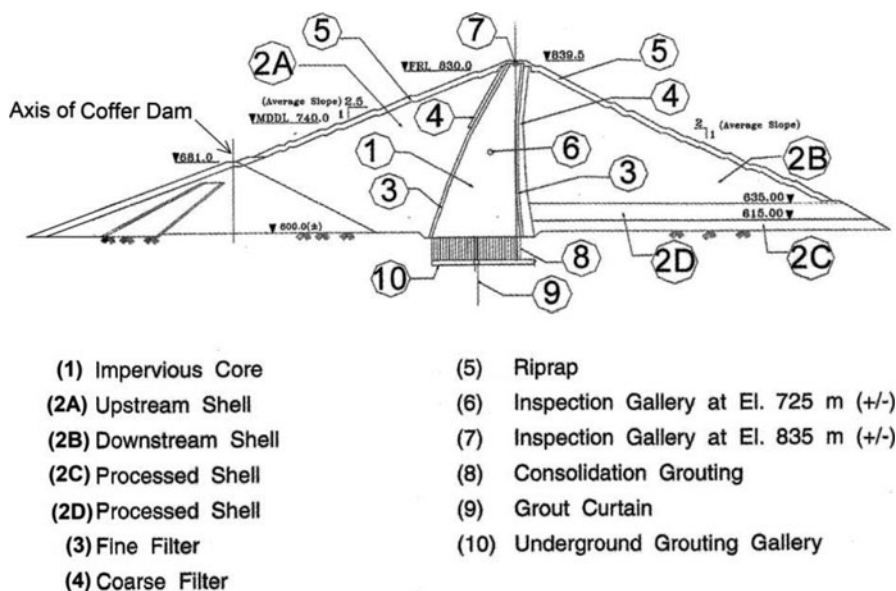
Typical section of Tehri dam showing upstream cofferdam as part of main dam.
